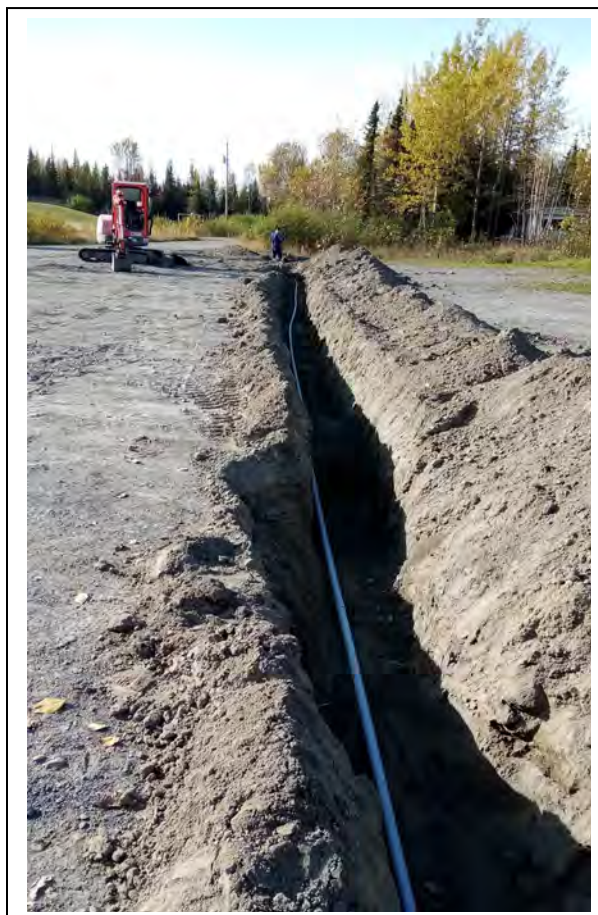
Conduit for underground electrical line placed in trench, looking west along the south boundary of the ZipMart lot. The worker is standing at the planned location of a new meter pole. (September 28, 2023)
